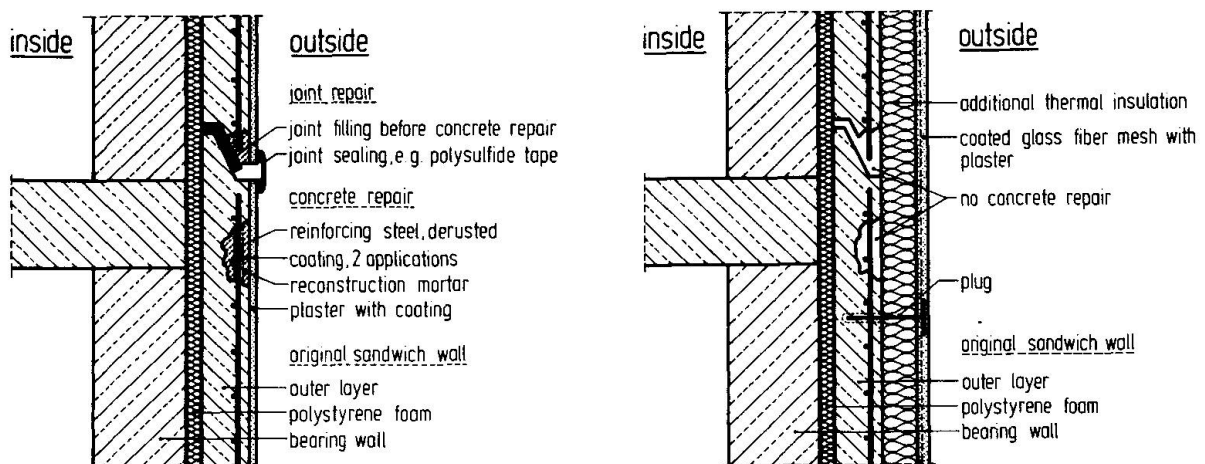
Common method of concrete repair to the exterior of a sandwich wall (left), alternative repair using an external thermal insulation composite system (ETICS, right)
